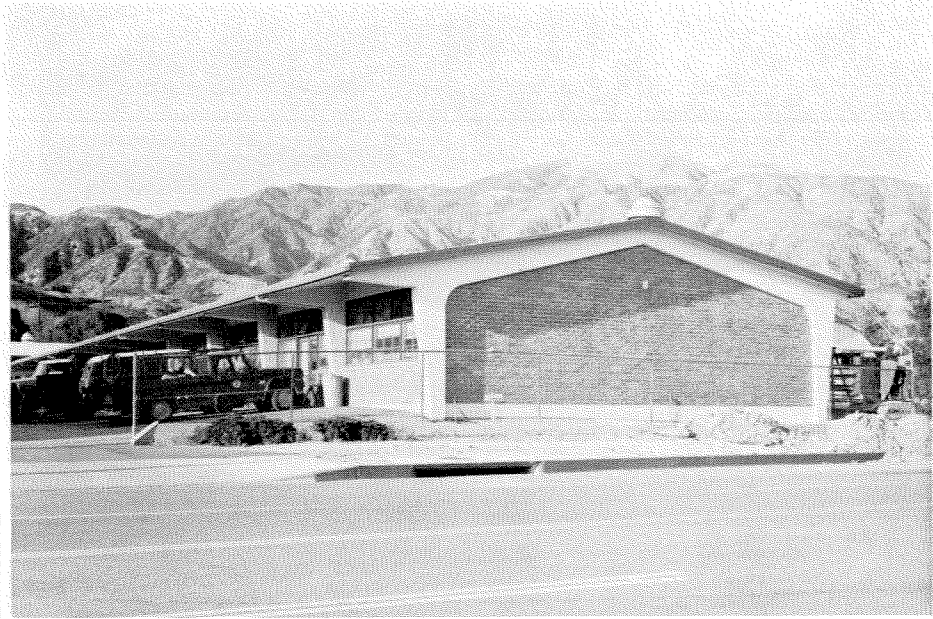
Reinforced concrete portal framed building with no visible damage. Olive View Hospital.
